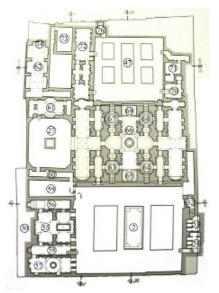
Basement Floor Plan of Amini Khanch-Hussainia (Mohamadzadeh et al., 2007)
